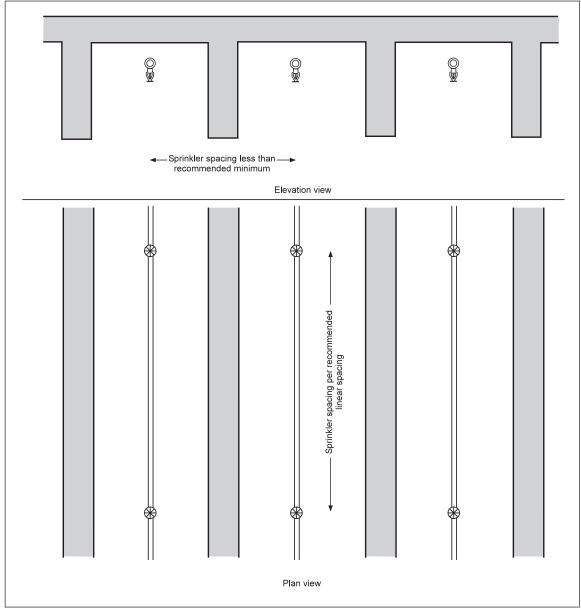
Spacing of Nonstorage sprinklers when installed in every bay channel formed by solid structural members
